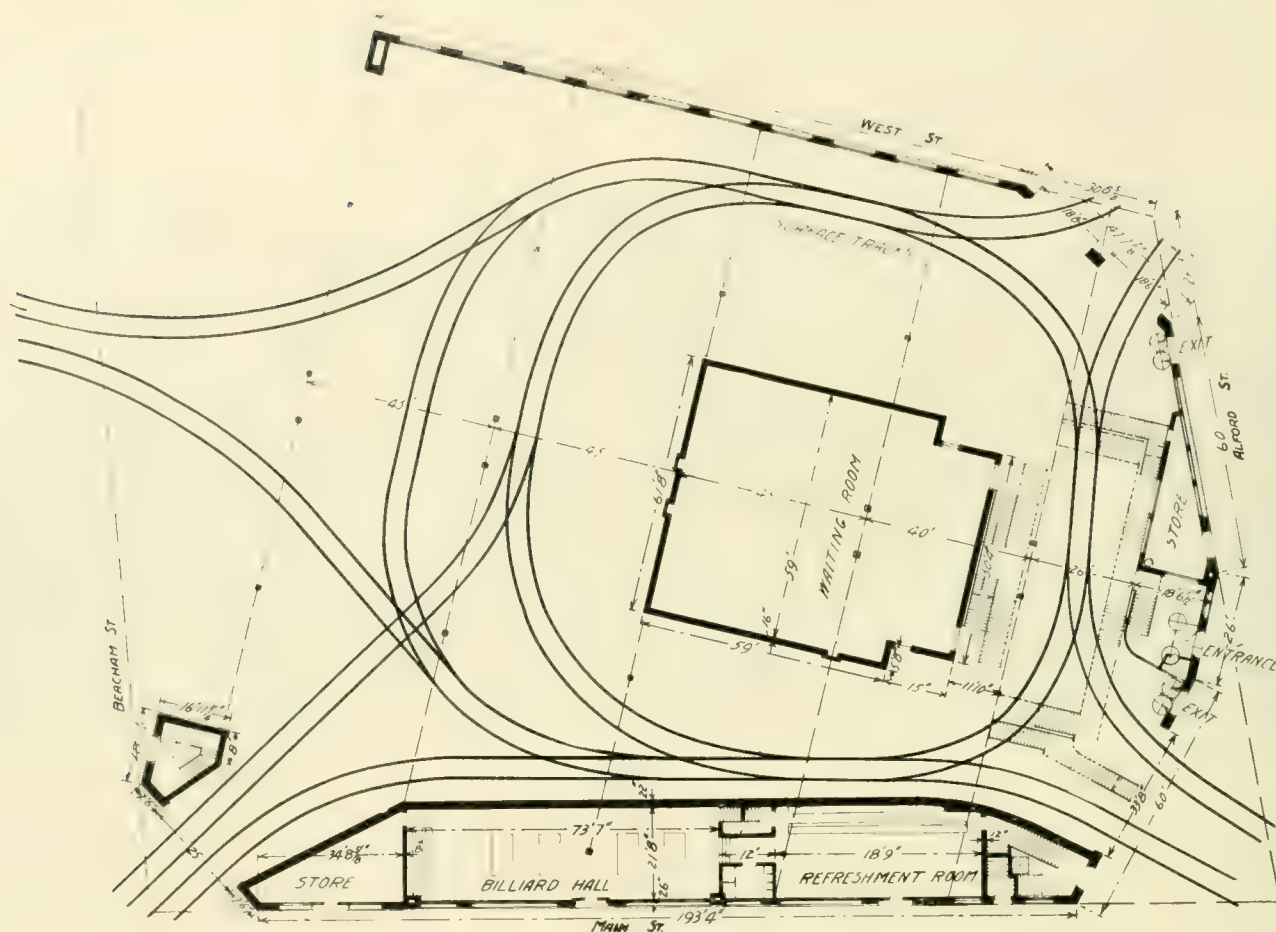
GROUND PLAN OF SULLIVAN ST. STATION.
